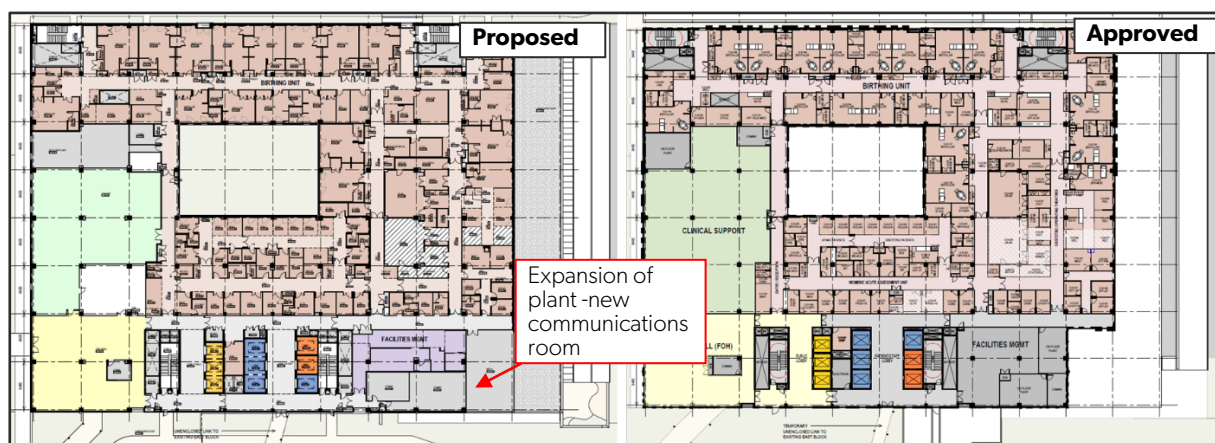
| Proposed (left) and approved (right) Level 1 floor plan (Source: Modification Application)
